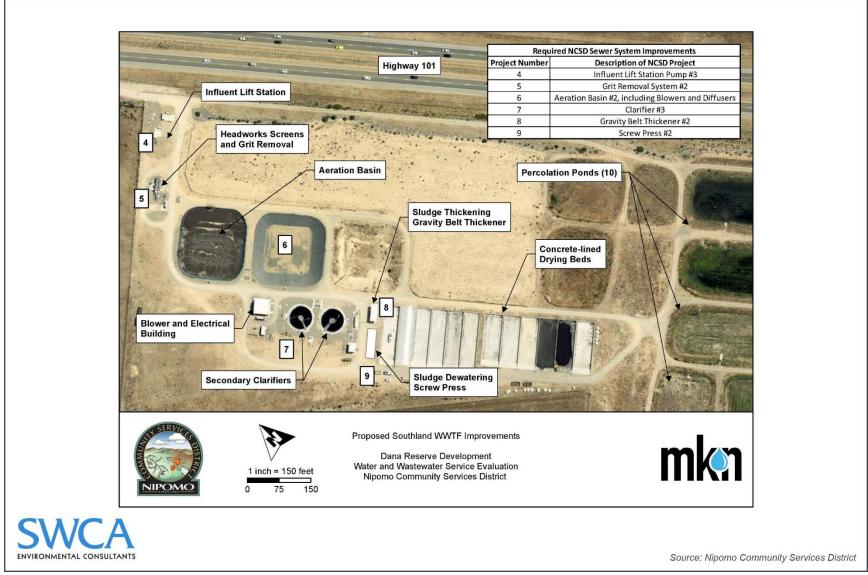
Off-site wastewater system improvements: Southland Wastewater Treatment Facility.
